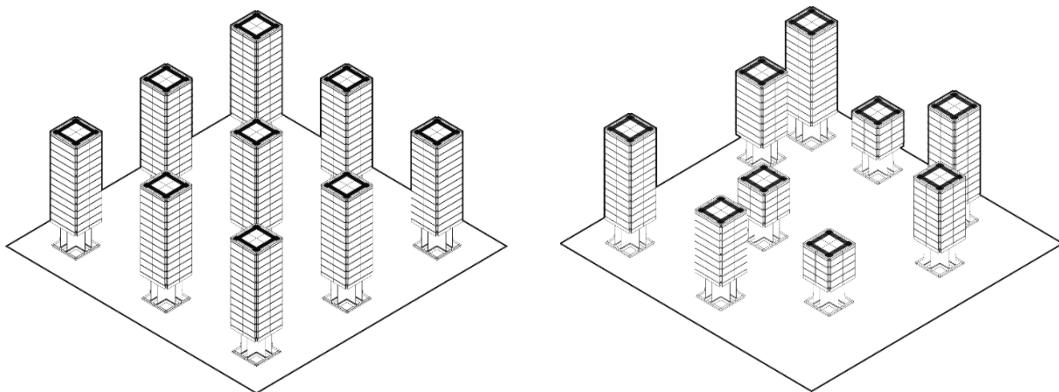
Examples of different horizontal and vertical building layouts (Hachem-Vermette, 2020)
